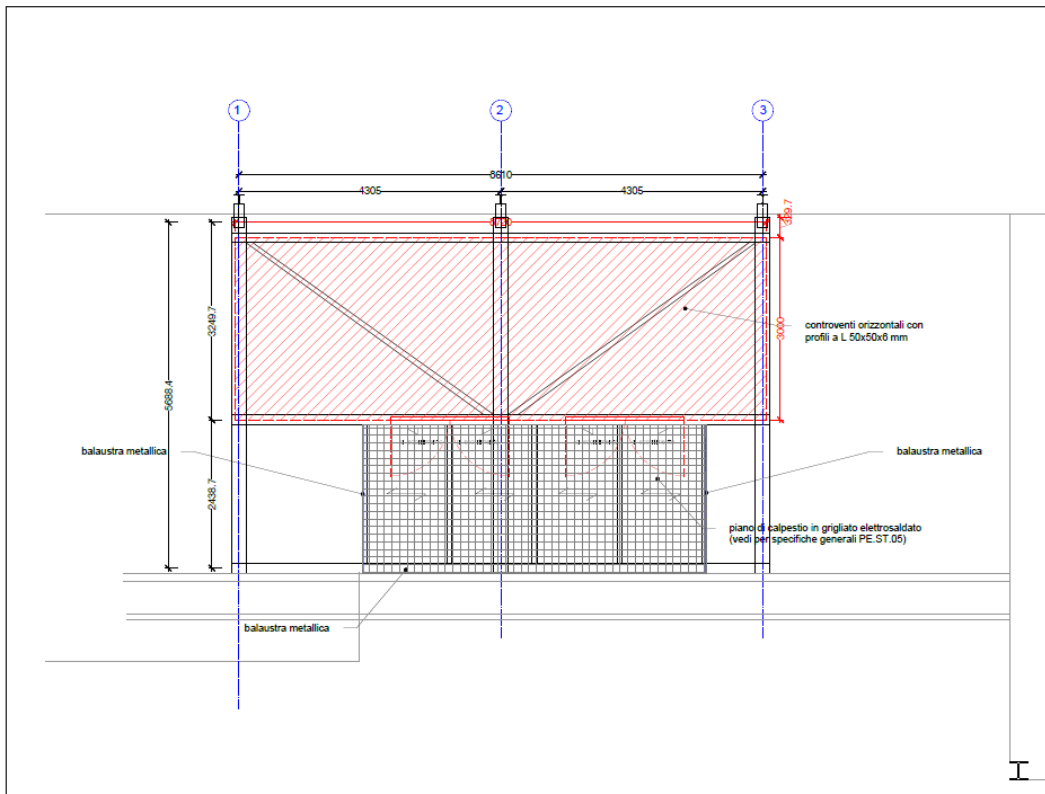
Plan view of the metal substructure for the new geothermal plant.
